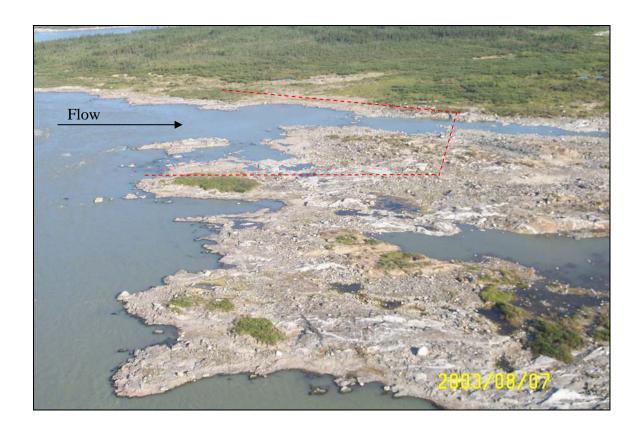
View looking northwest, showing Spillway Area and Approach Channel.
